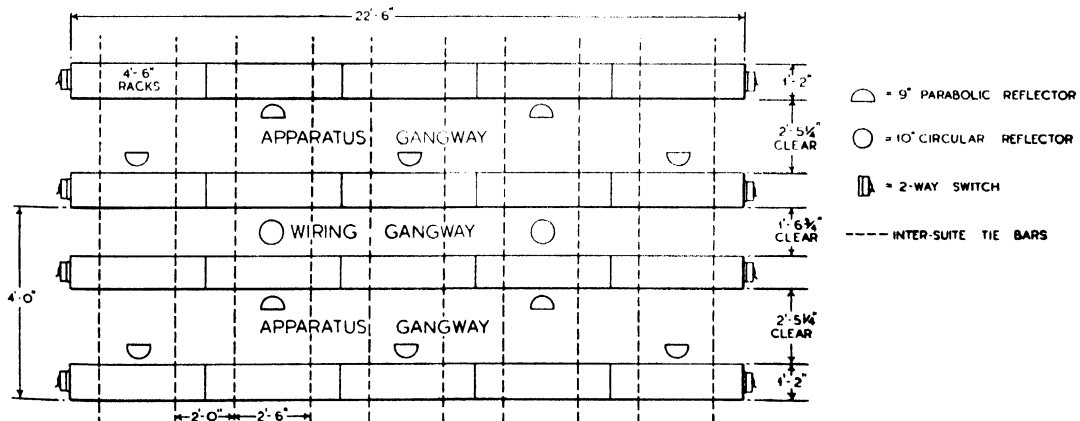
FLOOR PLAN OF APPARATUS RACKS SHOWING POSITIONS OF INTER-SUITE TIE-BARS
